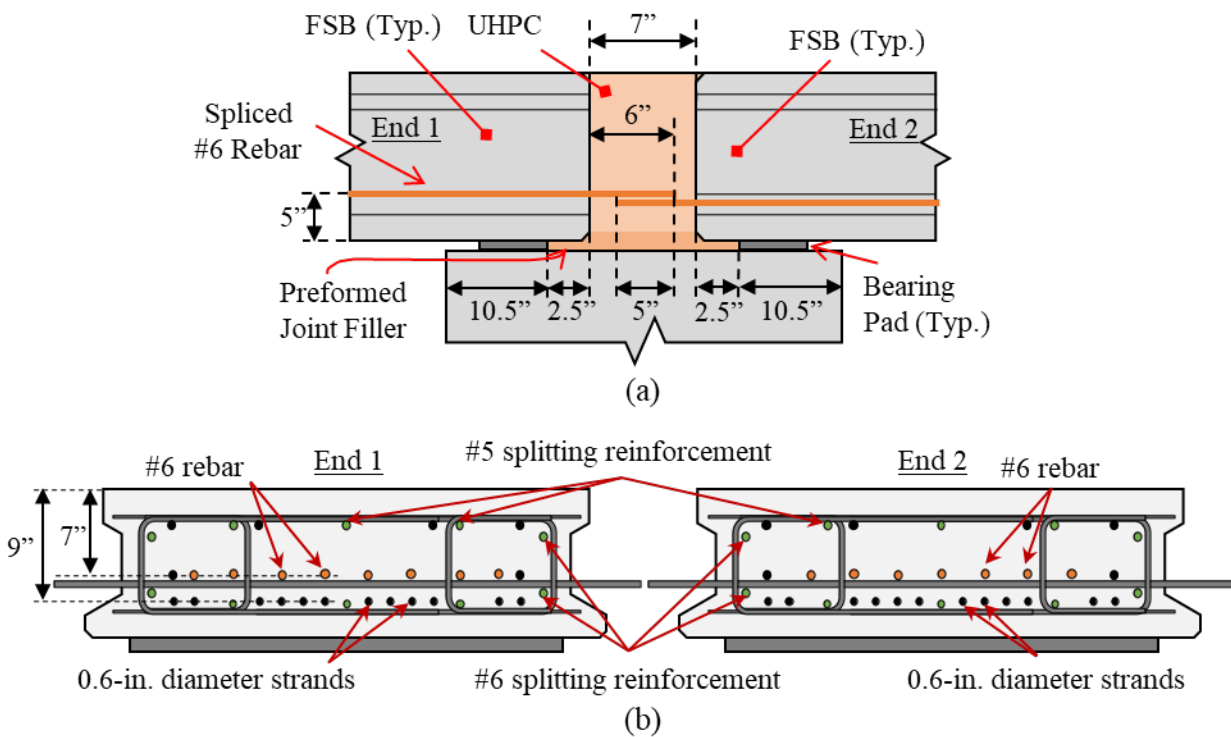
Positive moment connection with 8 #6 mild reinforcement: (a) elevation and (b) ends view
